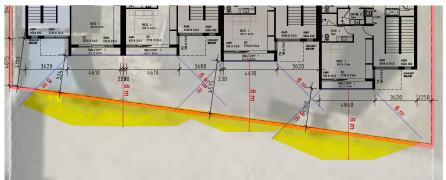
First Floor Plan (above) overlay of the subject site. The section highlighted in yellow shows the cone of vision arc encroachment from the balconies onto the southern adjoining lot.
